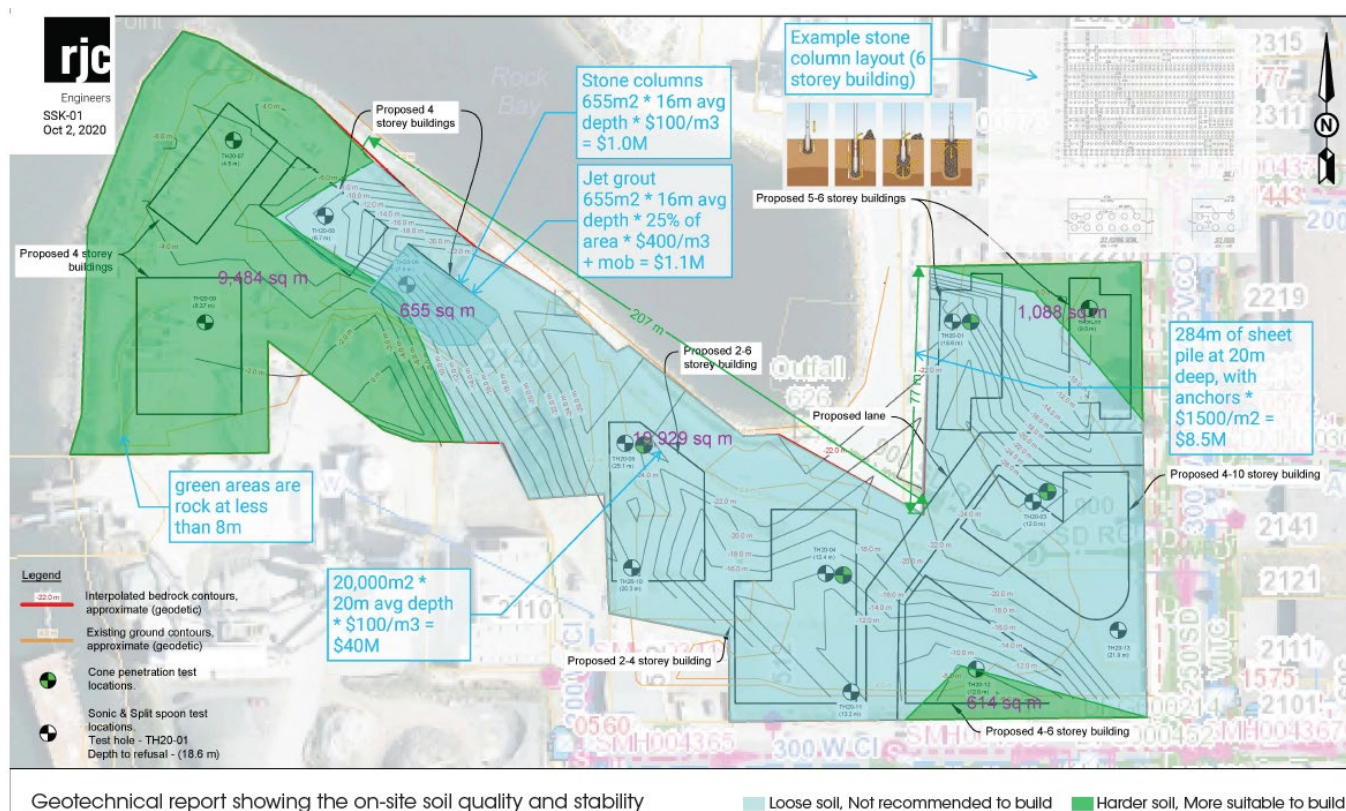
Geotechnical understanding of the on-site quality and stability (Ryzuk Geotechnical, 2020)
